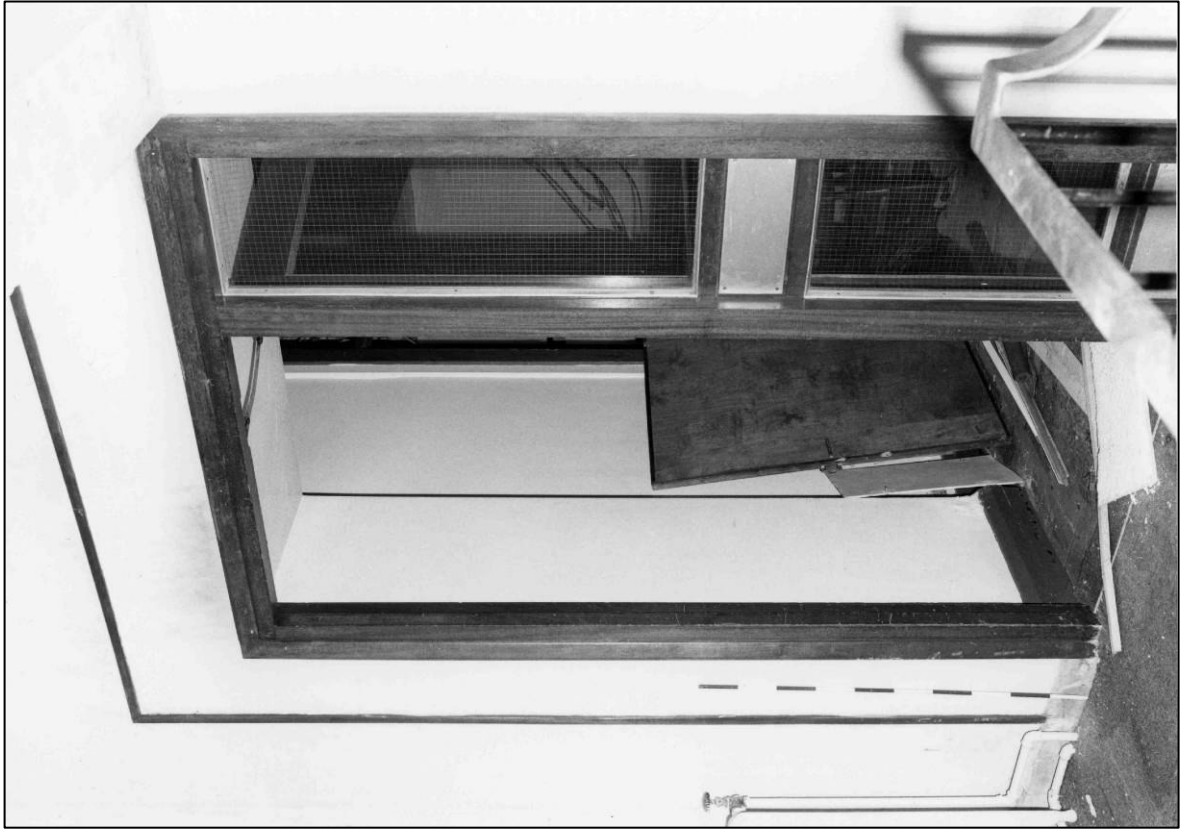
Staircase GF6, detail of doorway to N wall, looking NW (photo 4/9) (top to left).
